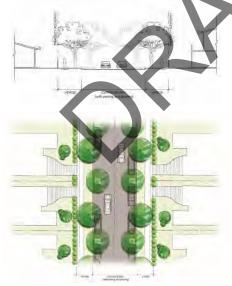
Indicative Layout of a Local Street (with Defined Planting and Parking in Carriageway)
